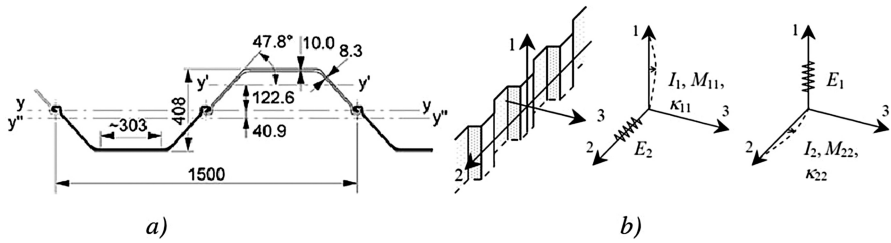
(a) Sheet pile profile AU14 in plane including dimensions ArcelorMittal, (b) the local system of axes in the wall element and various quantities
